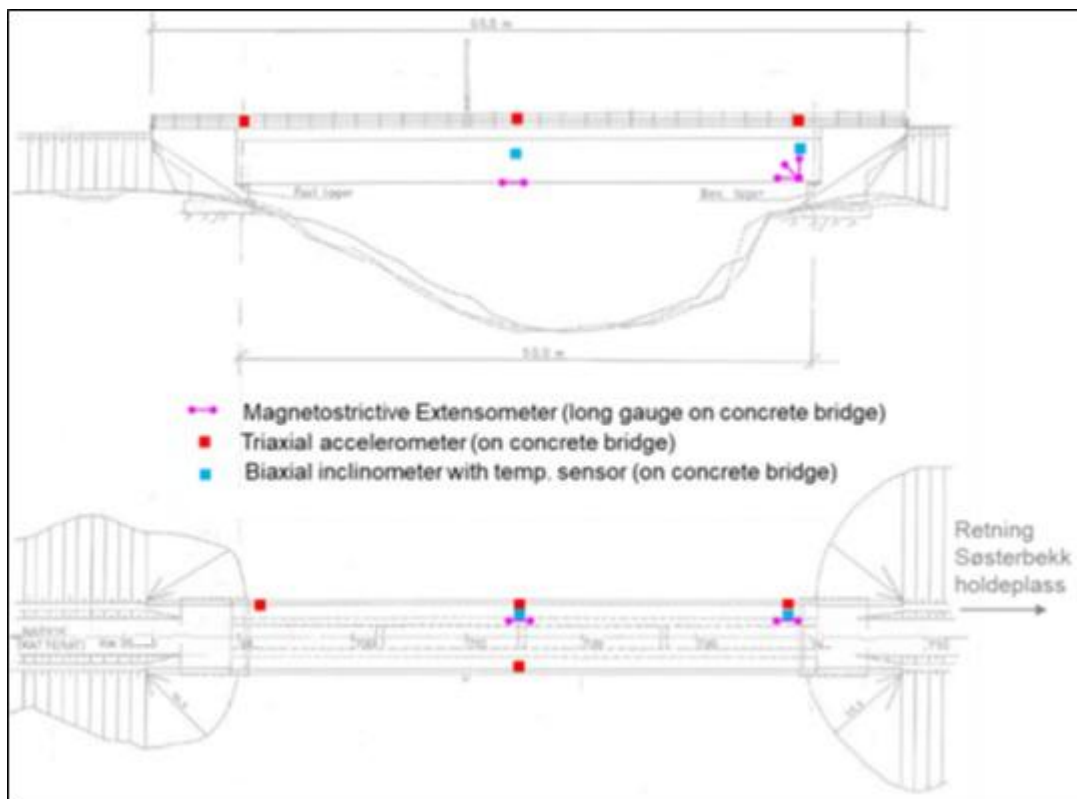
Instrumentation plan of sensor systems for Sørsterbekk bridge 1 showing type and placement of sensors.
